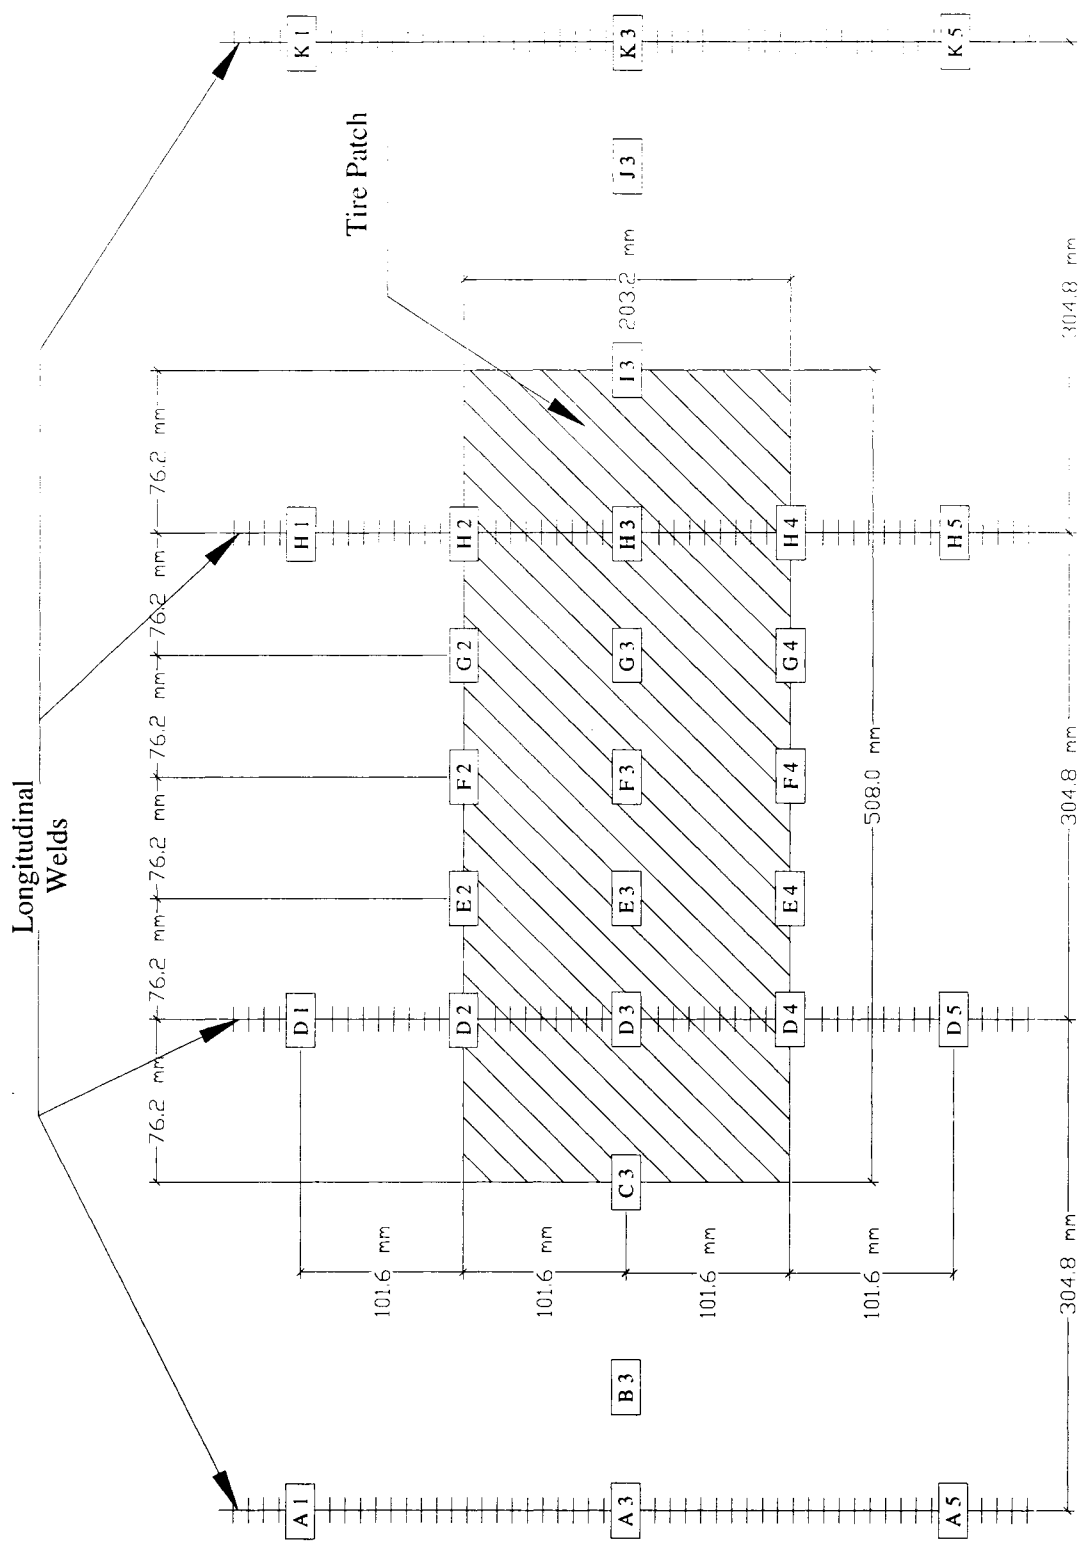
Failure Side A Gage Layout, Bottom of Side A
